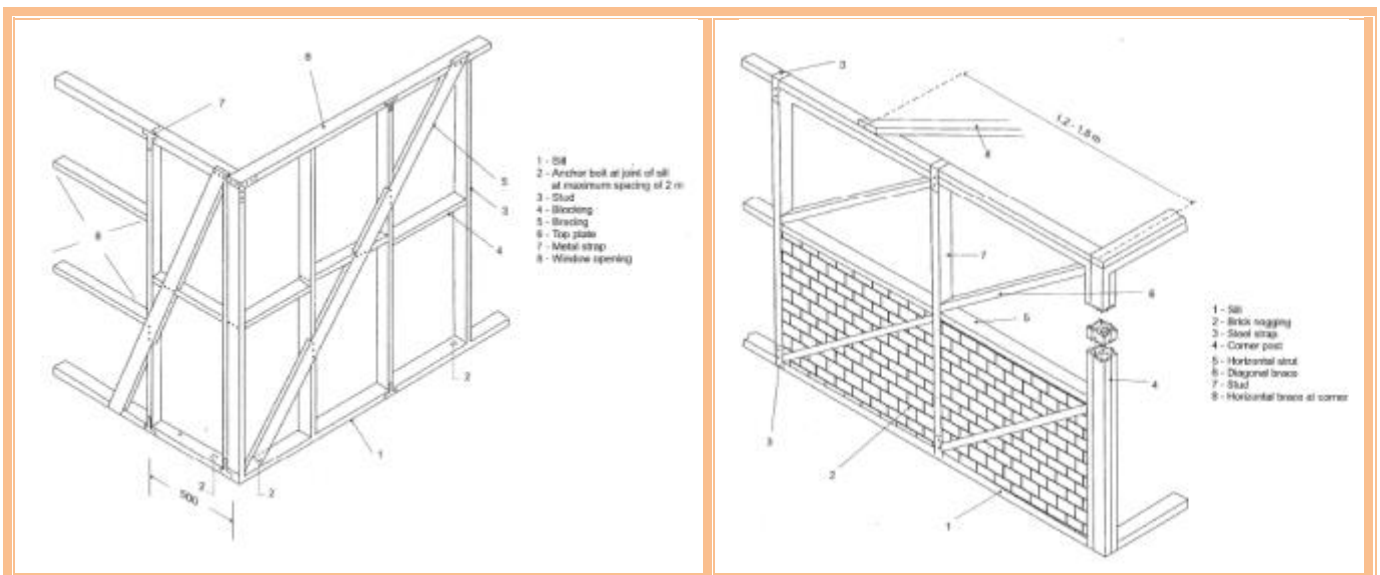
detailed of timber wall(stud walls) (Rush, 2007)
